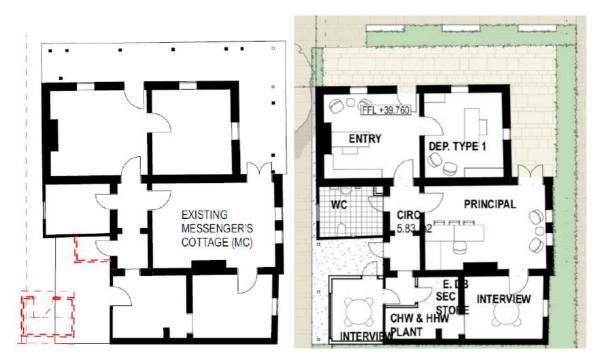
Existing/Demolition plan for Messenger's Cottage (left) in comparison with proposed (right) (Source: FJMT DA-2101 and DA-2002, 18.12.19)
